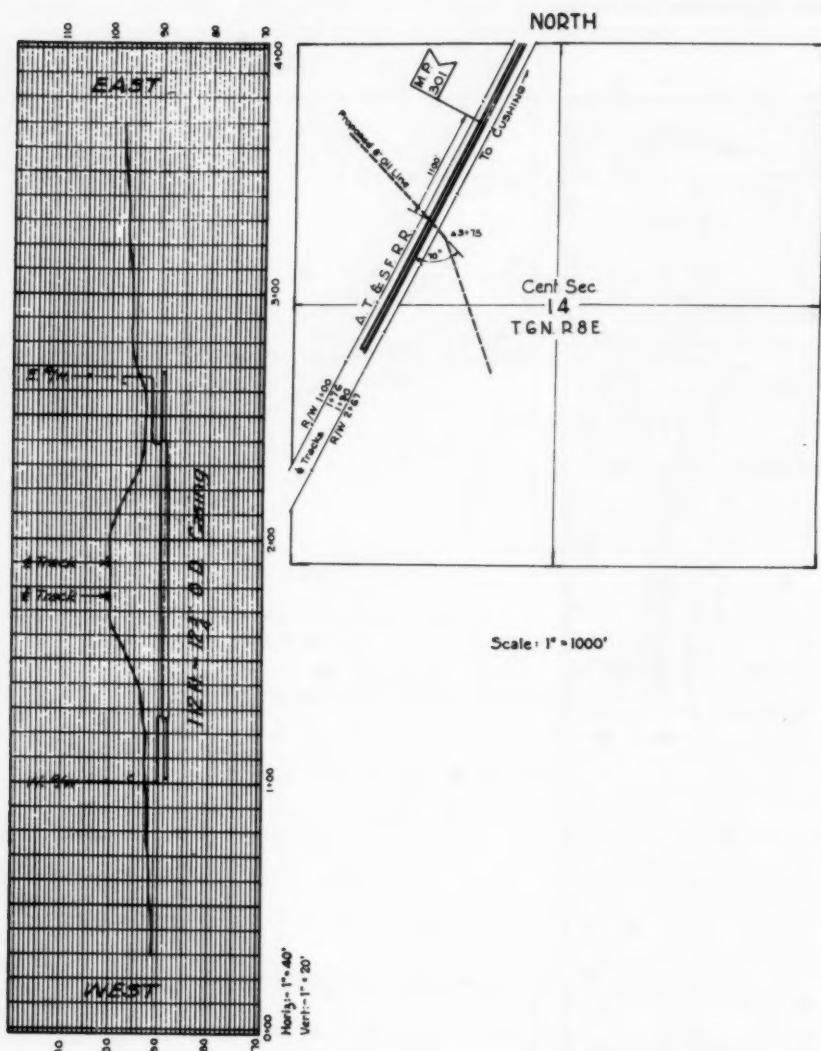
EXAMPLE OF METHOD USED TO SHOW A TYPICAL RAILROAD CROSSING
